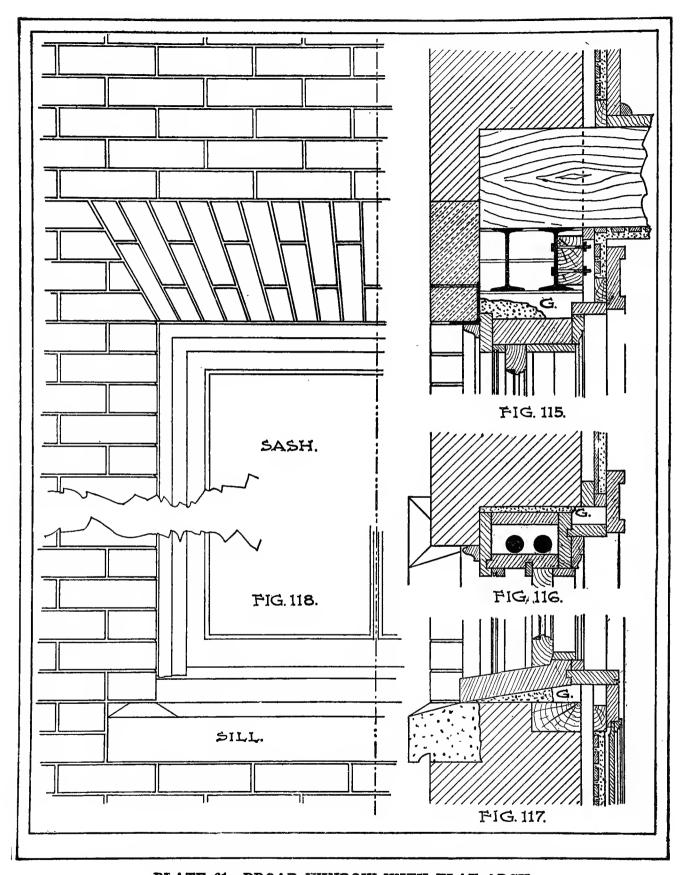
BROAD WINDOW WITH FLAT ARCH
